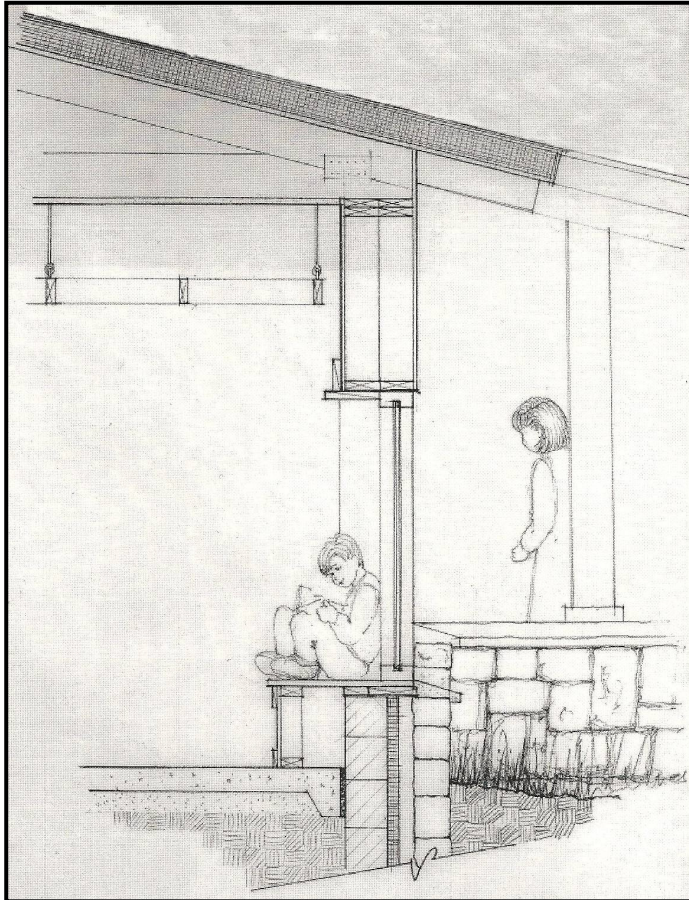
Detail – wall section demonstrating scale modifiers – by author.
